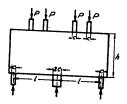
Continuous Beam on Three Supports as in the Concrete Test
